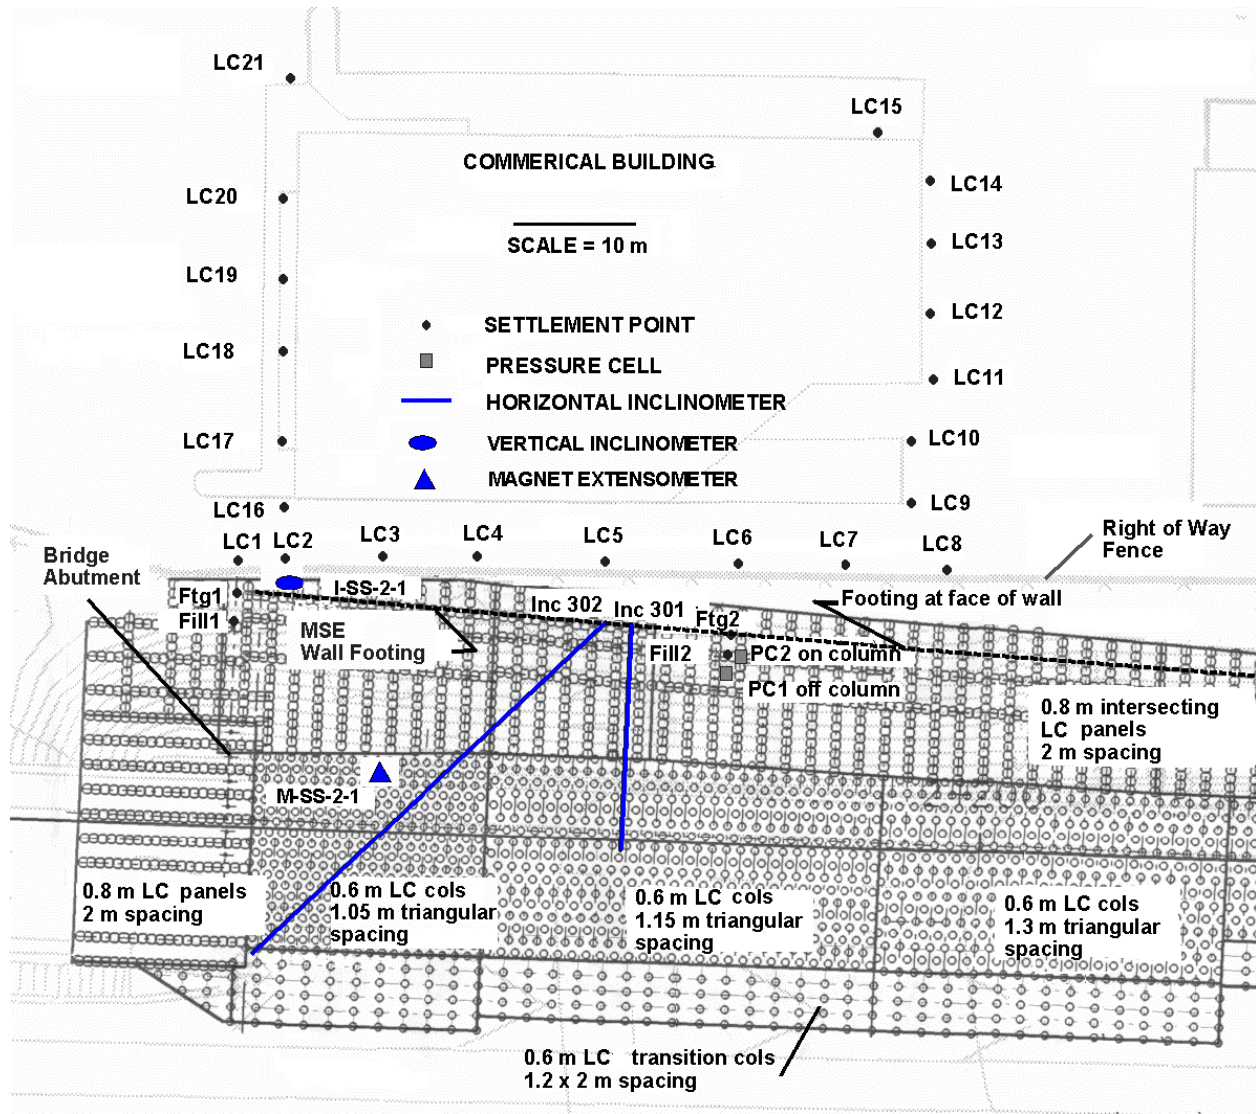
Instrumentation Layout (Plan View) for the Lime Cement Column Array.
